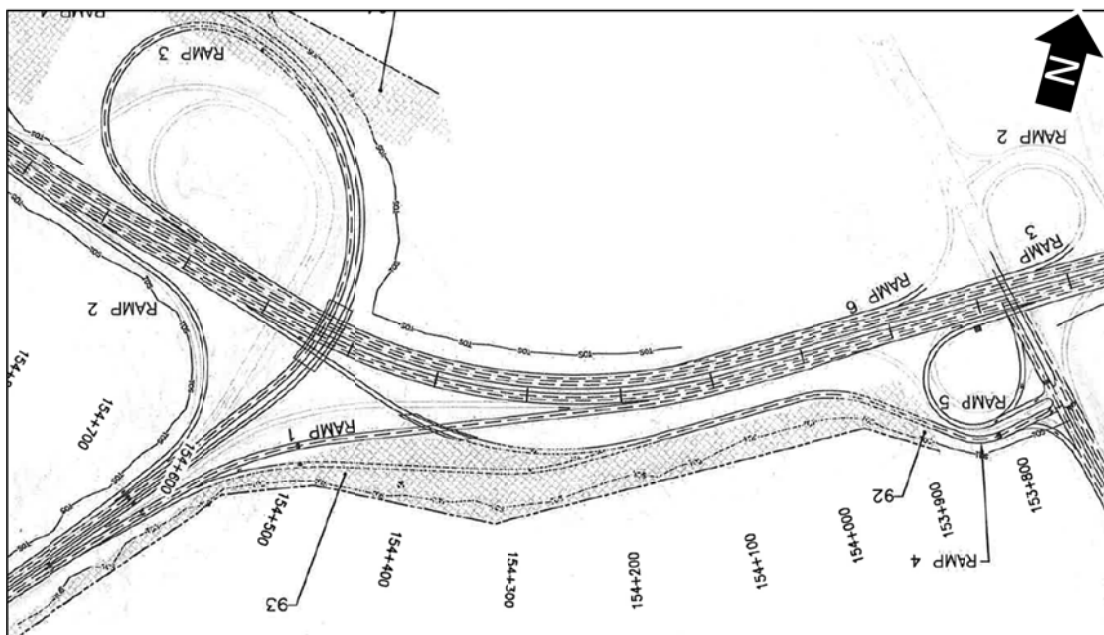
Conceptual Plan: Highway 102 North of Highway 103
